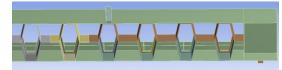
Beam model with Hexagonal folded web plate of one interior stiffener
